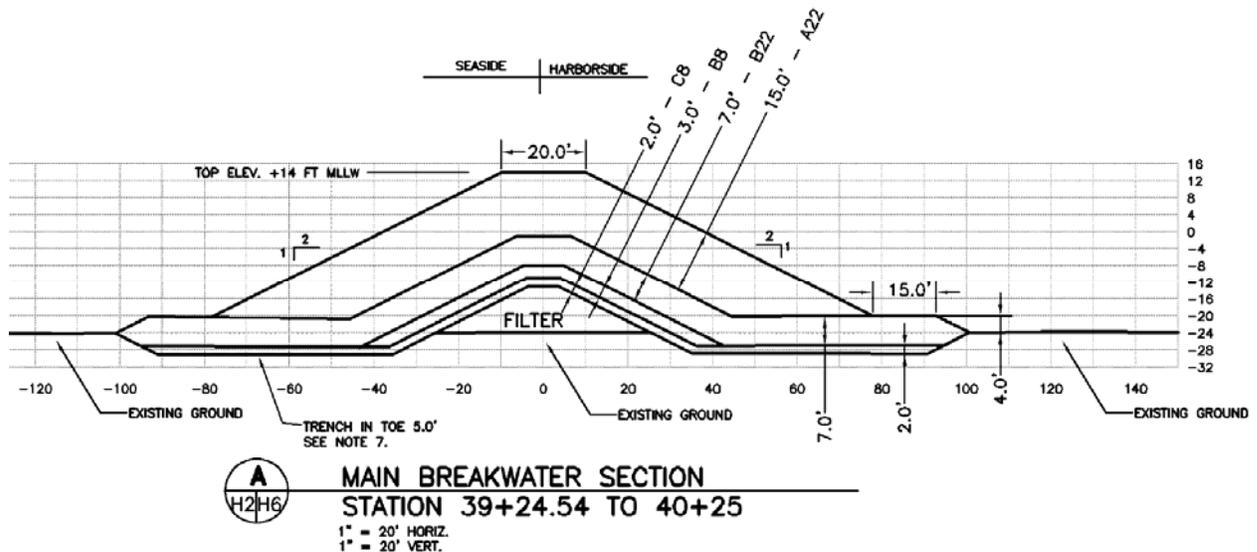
Typical Section – East Breakwater (USACE Design Drawing, 2005)
